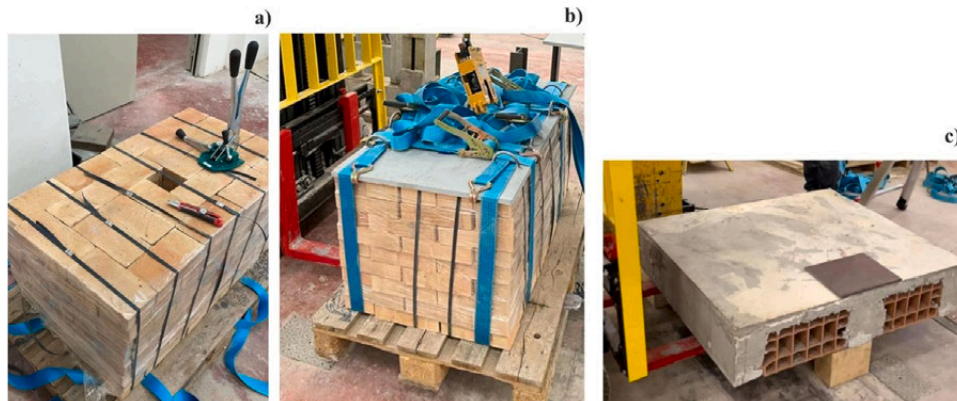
Impact loads: a) Assembly of brick stack; b) one of the 600 kg brick stack; c) portion of mixed reinforced concrete and hollow tiles floor.
